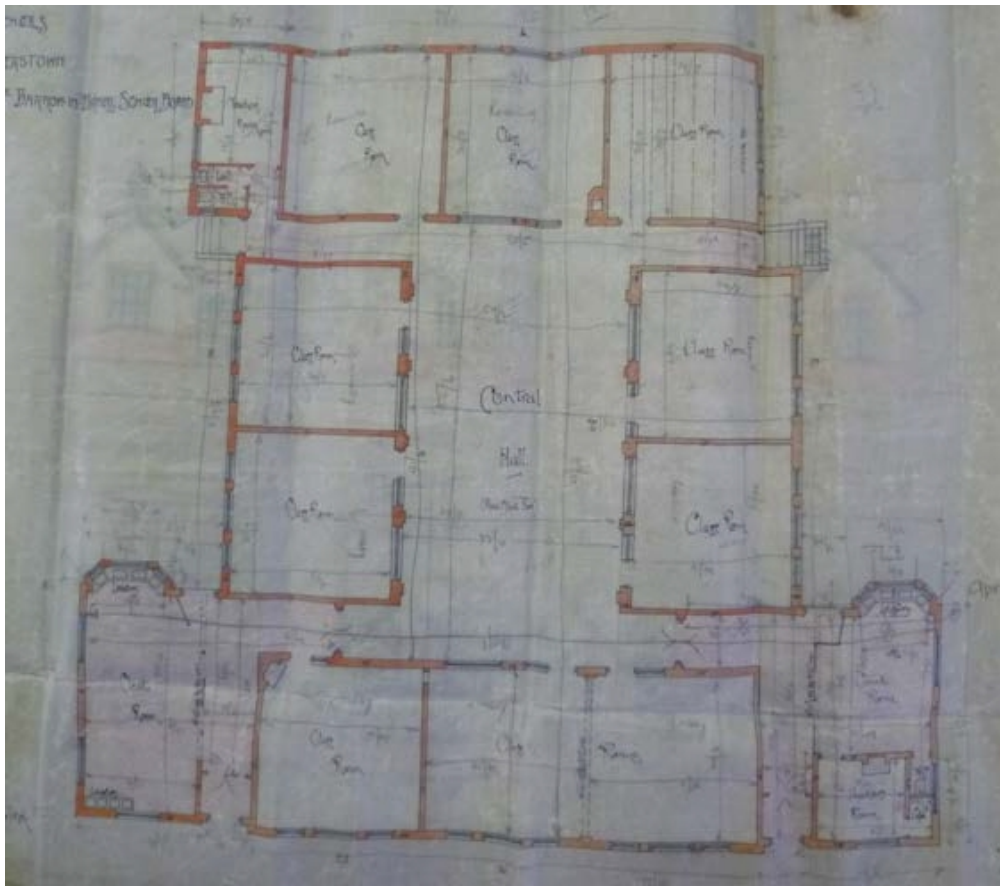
Ground floor plan as proposed (CAC(B) Building Control Plans 4324 1901)
